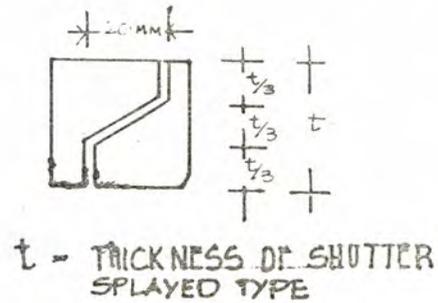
SKETCH ILLUSTRATING DIMENSIONS OF SHUTTER
